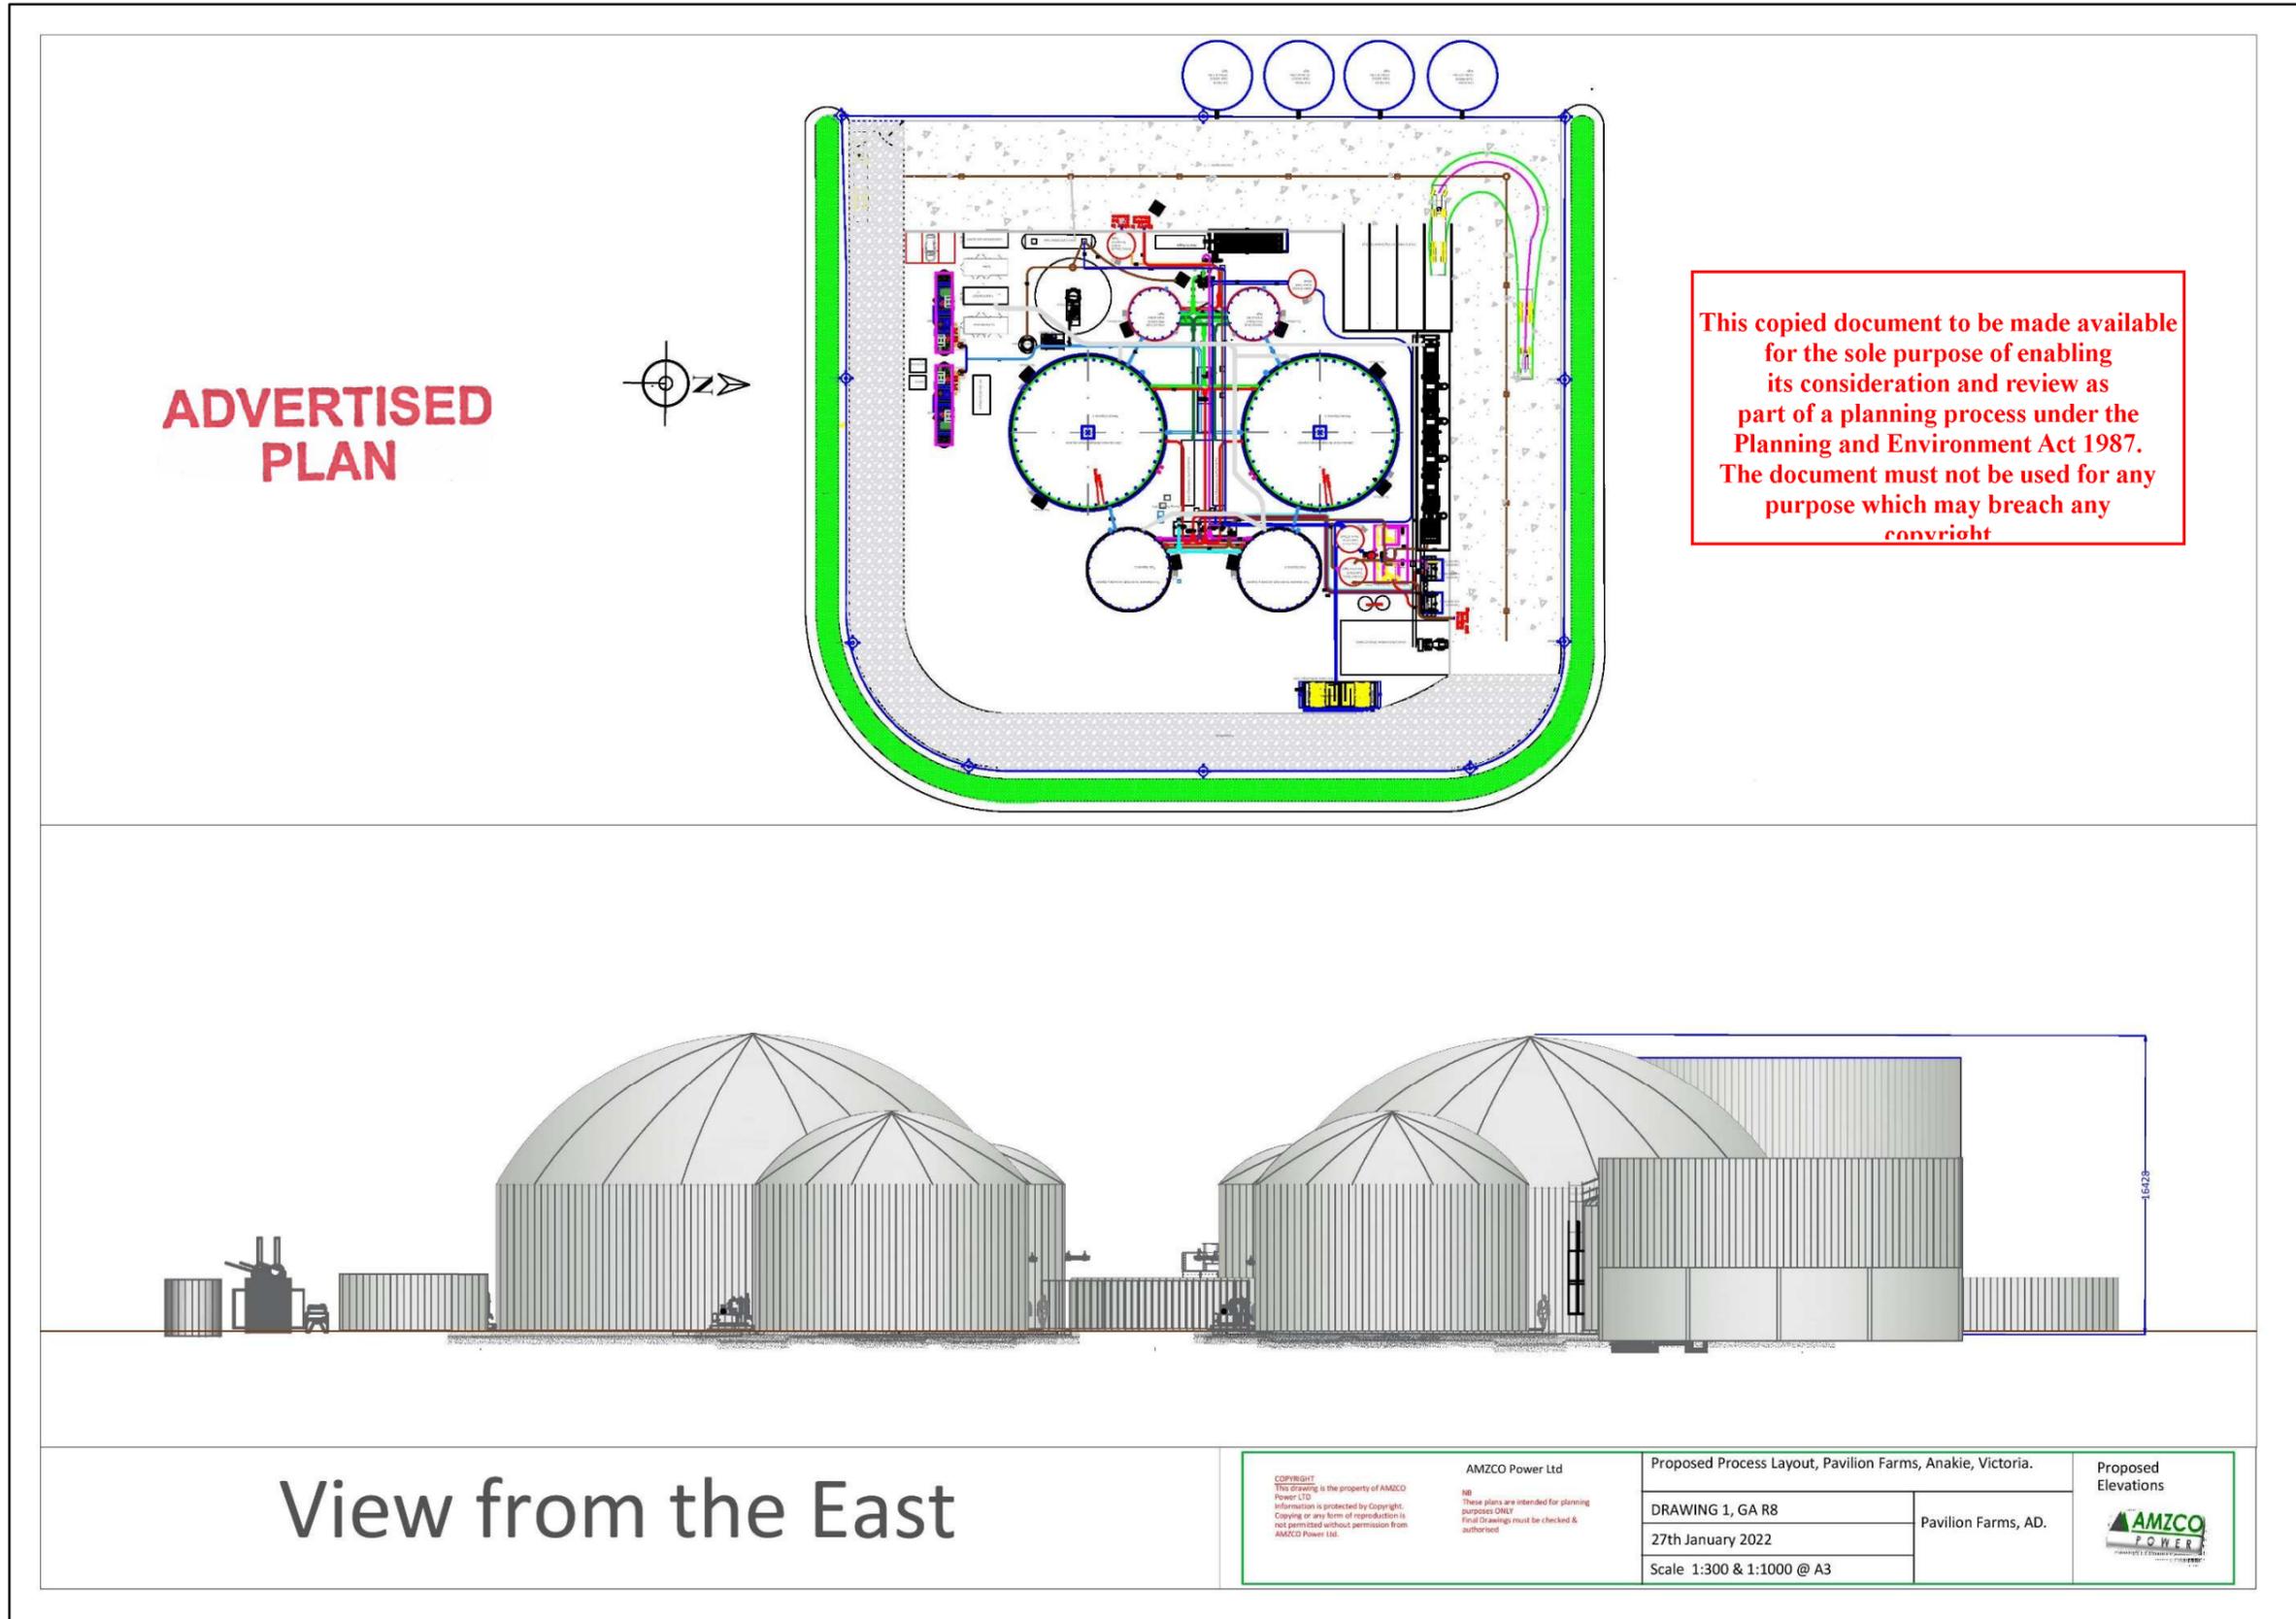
Site layout and elevation: Eastern perspective of the Proposed Fertiliser Facility
